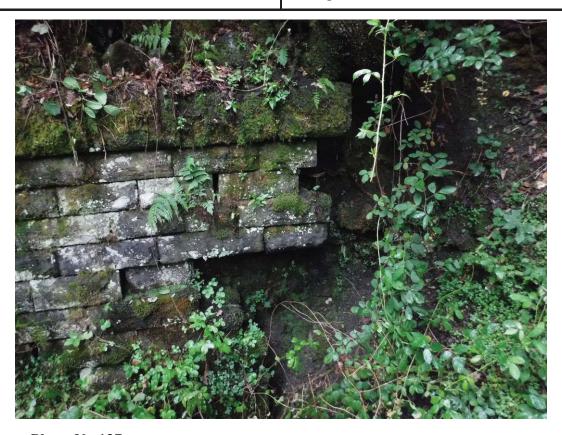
Northeast Portal, Stonework, end of parapet, c.5No. blocks missing.
